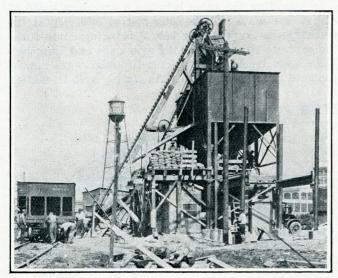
UNLOADING MATERIALS AT MIXING PLANT
